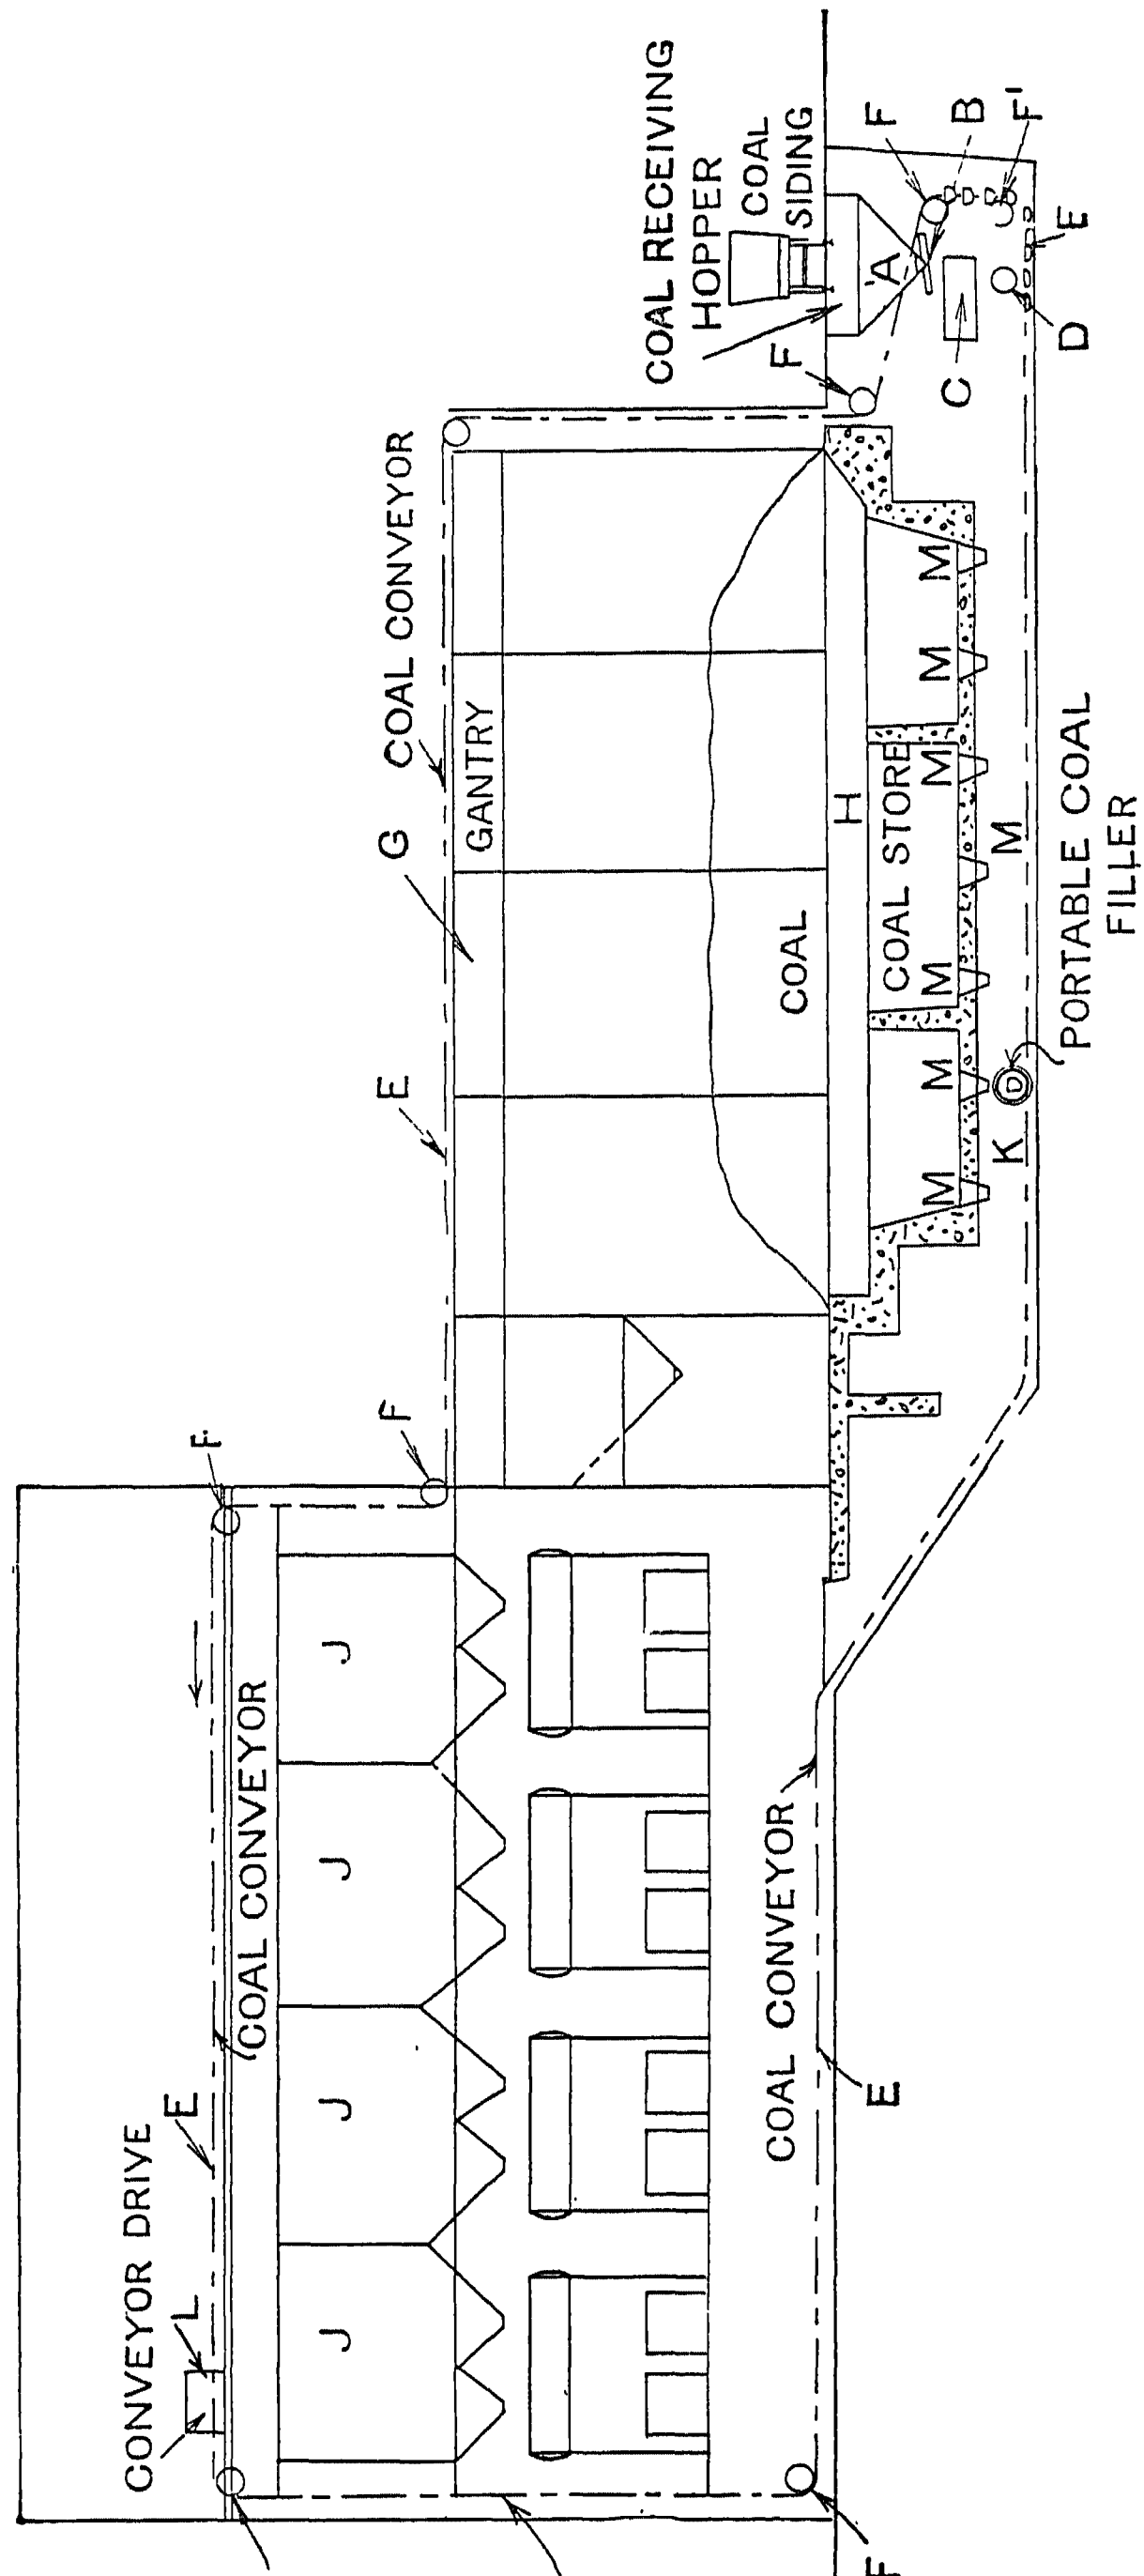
Typical Arrangement of Power Station with Gravity Bucket Coal Elevator
